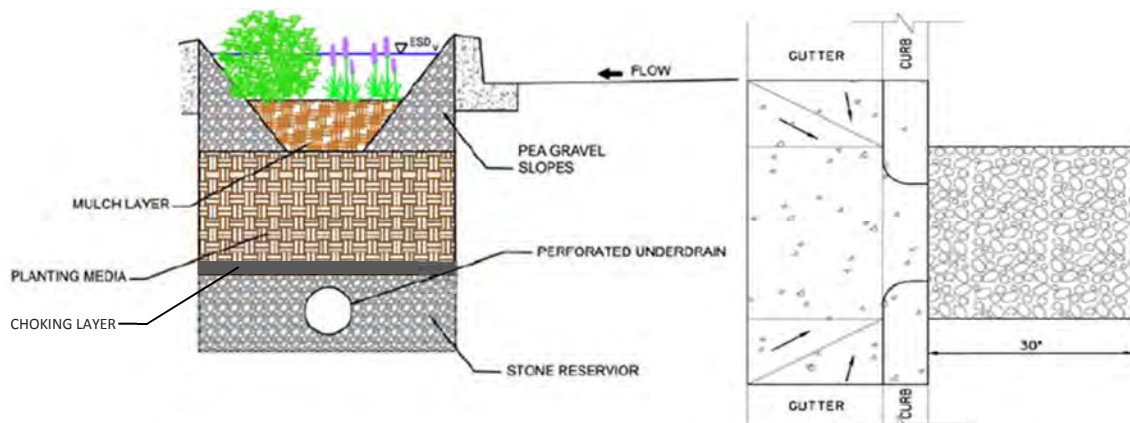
Typical Cross Section of Bioretention (MDE 2009) and Curb Cut
